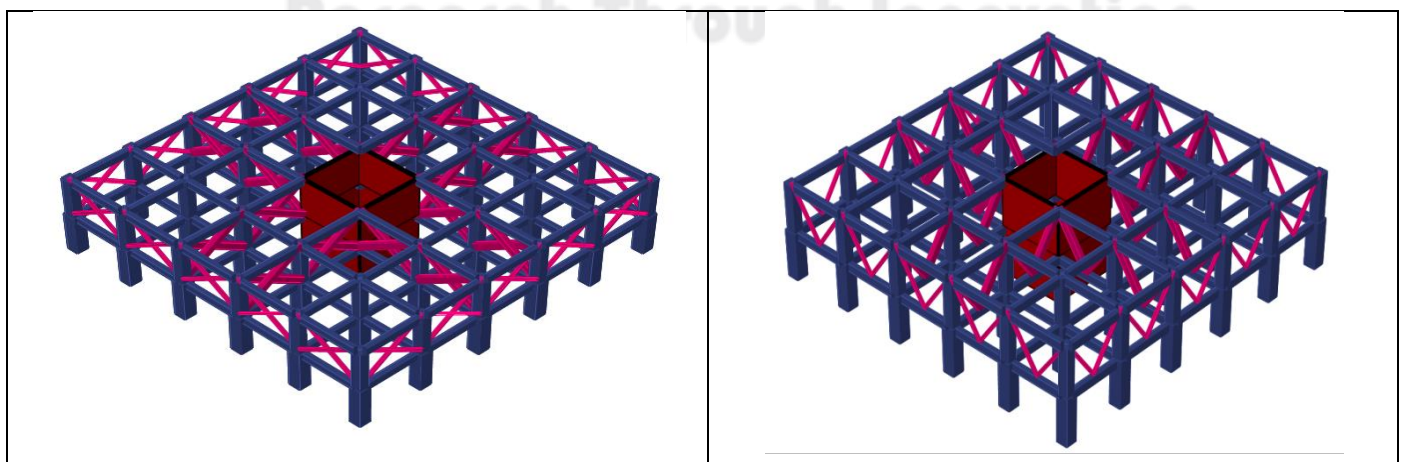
X-type and V-type Braced Concrete Outrigger- With Belt Truss
